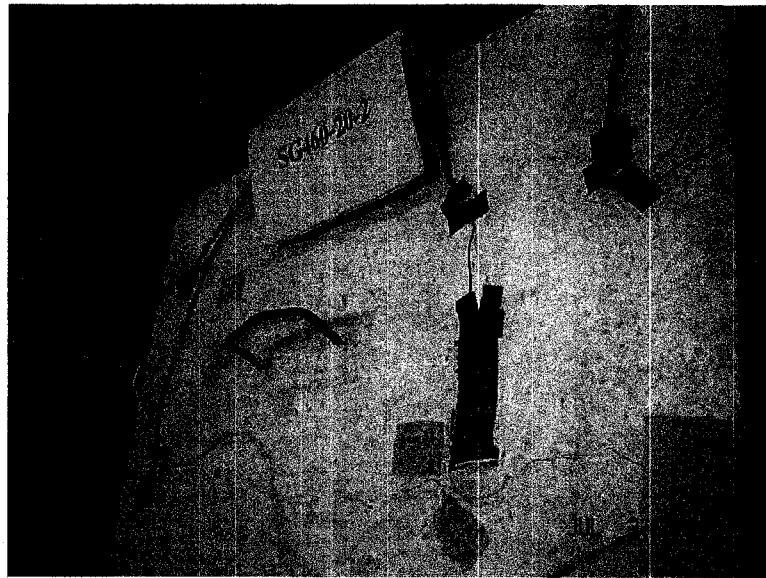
Top view of specimen SG460-20-2 showing cracks 1 and 2
